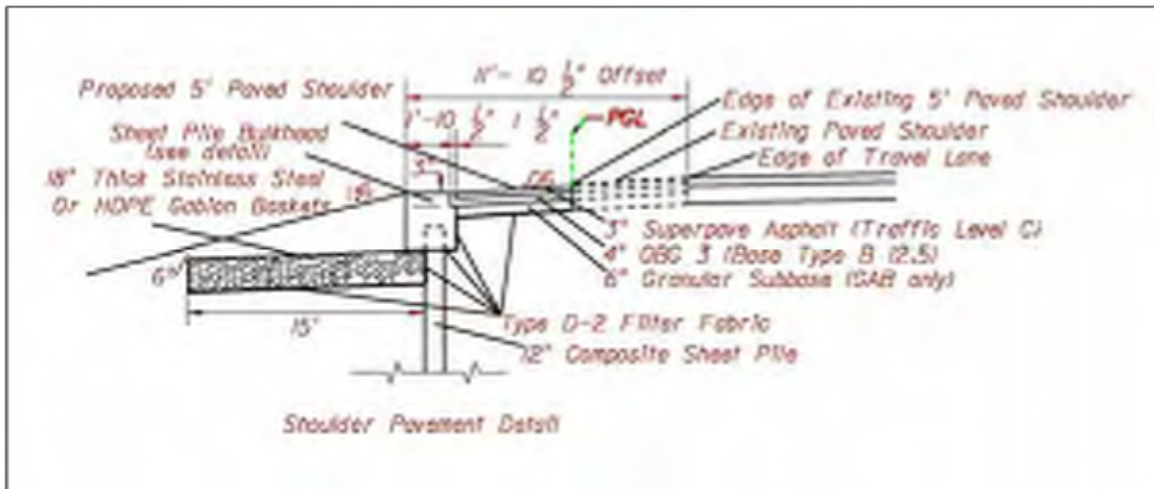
Sheet pile, with buried gabions for scour protection, at edge of pavement to resist pavement damage due to coastal storm surge overwash. (Florida DOT figure).
